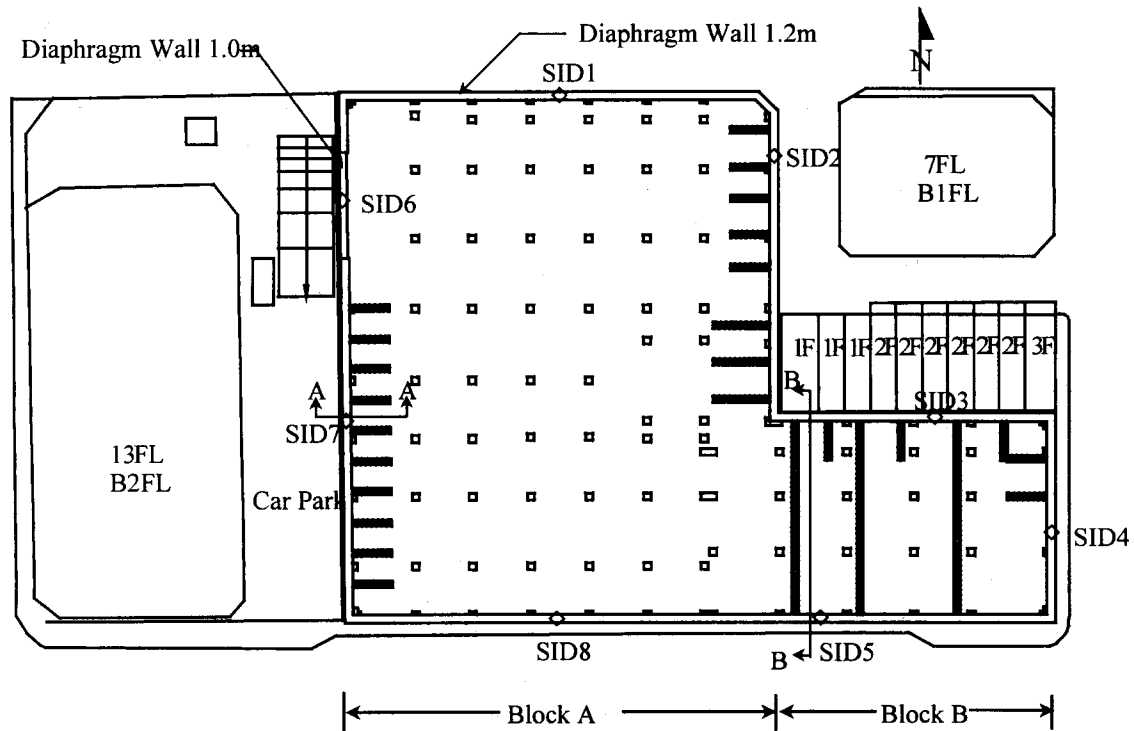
Plan and Layout of Ground Treatment for Job 1
